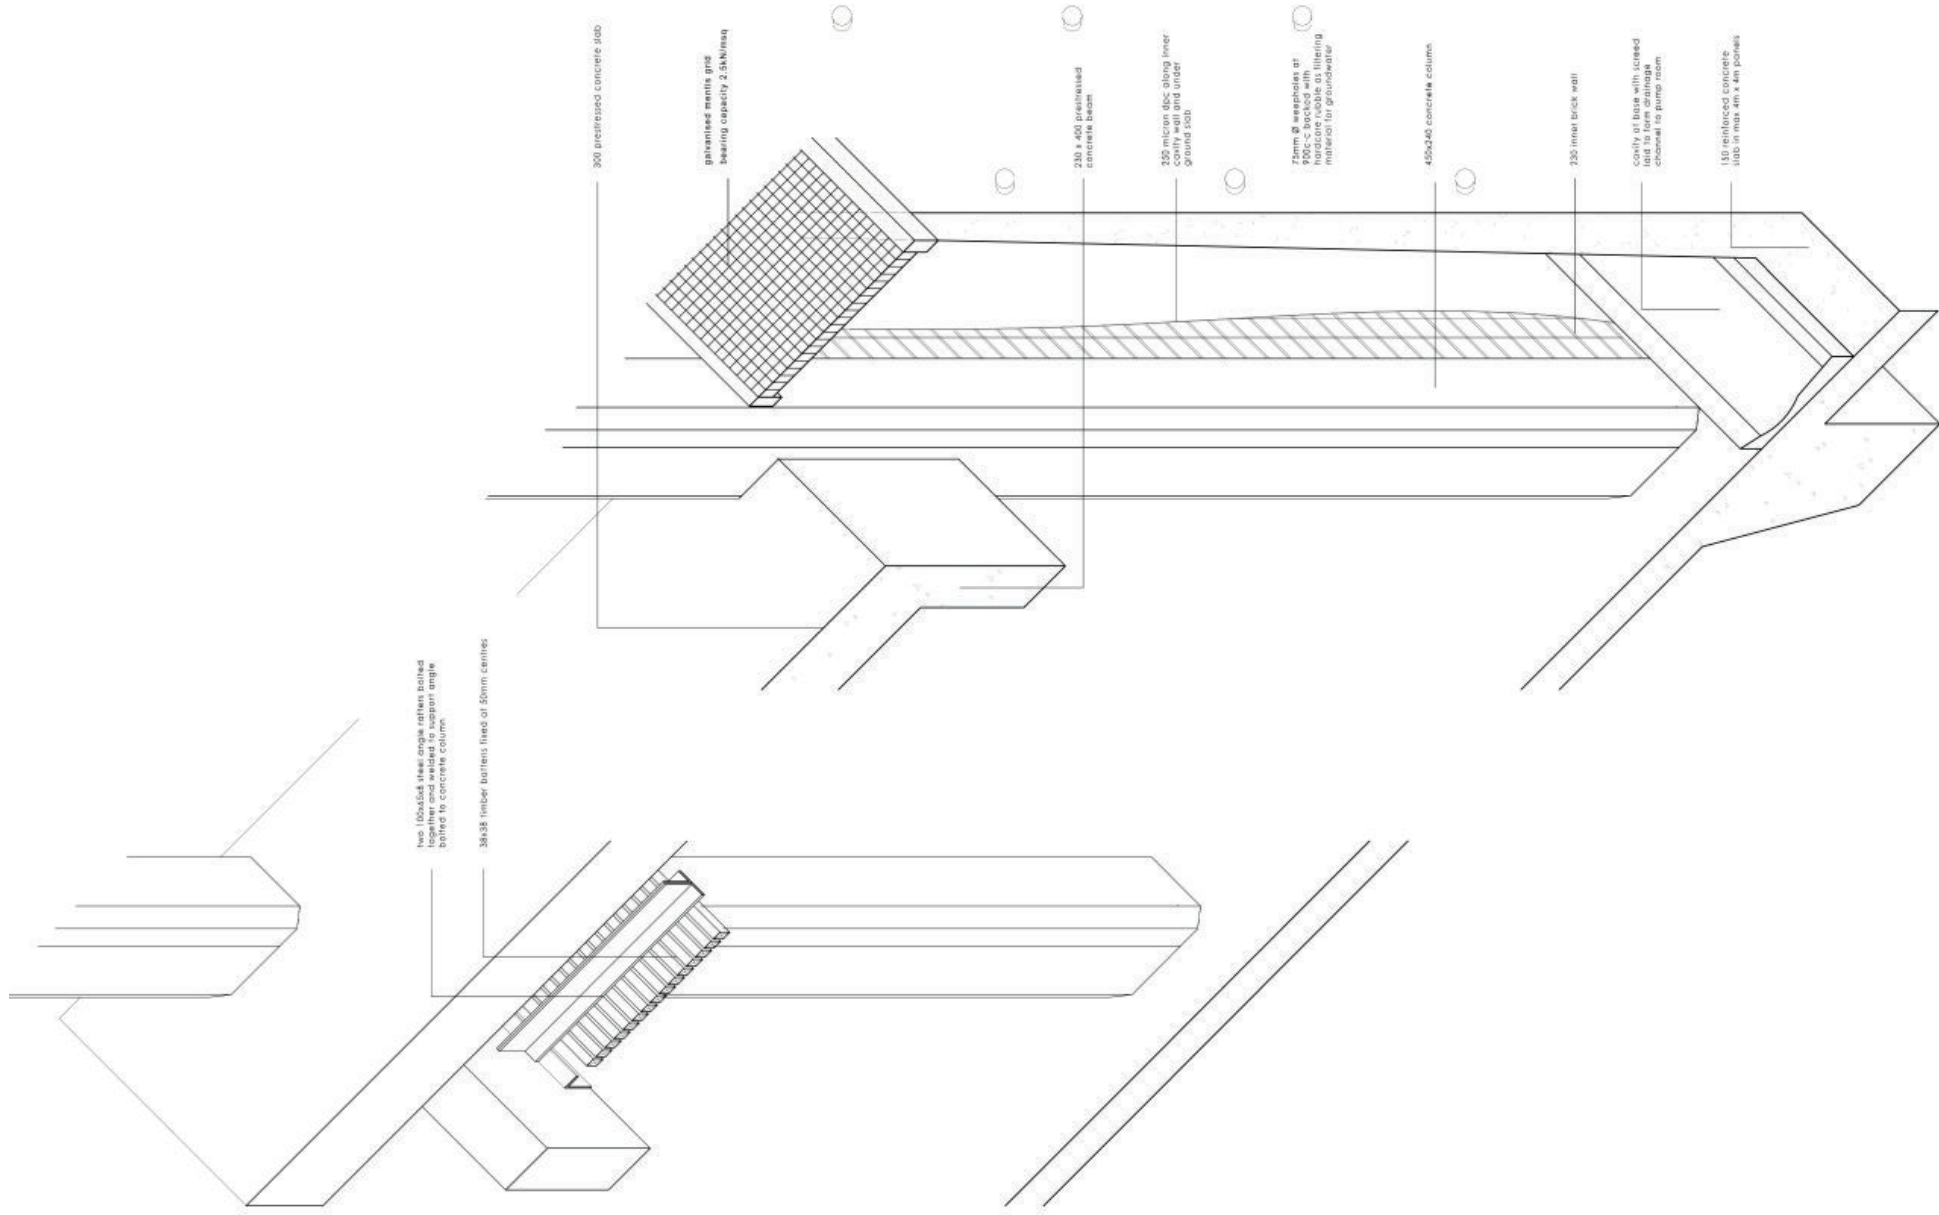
Detail B - Axonometric projection of the concrete structure and retaining wall (Reduced scale to fit)
